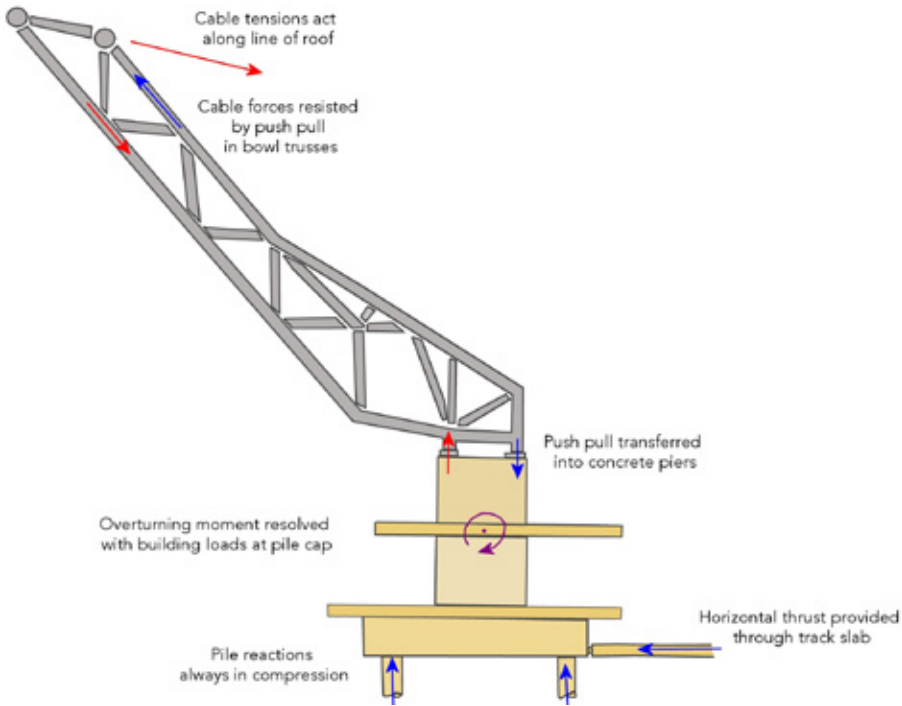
Diagram of the principal structural load paths in the Velodrome's steel trusses and piled concrete foundations
